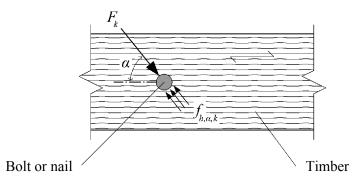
Embedment strength of a bolt or nail (d > 8 mm) loaded at an angle α to the grain
